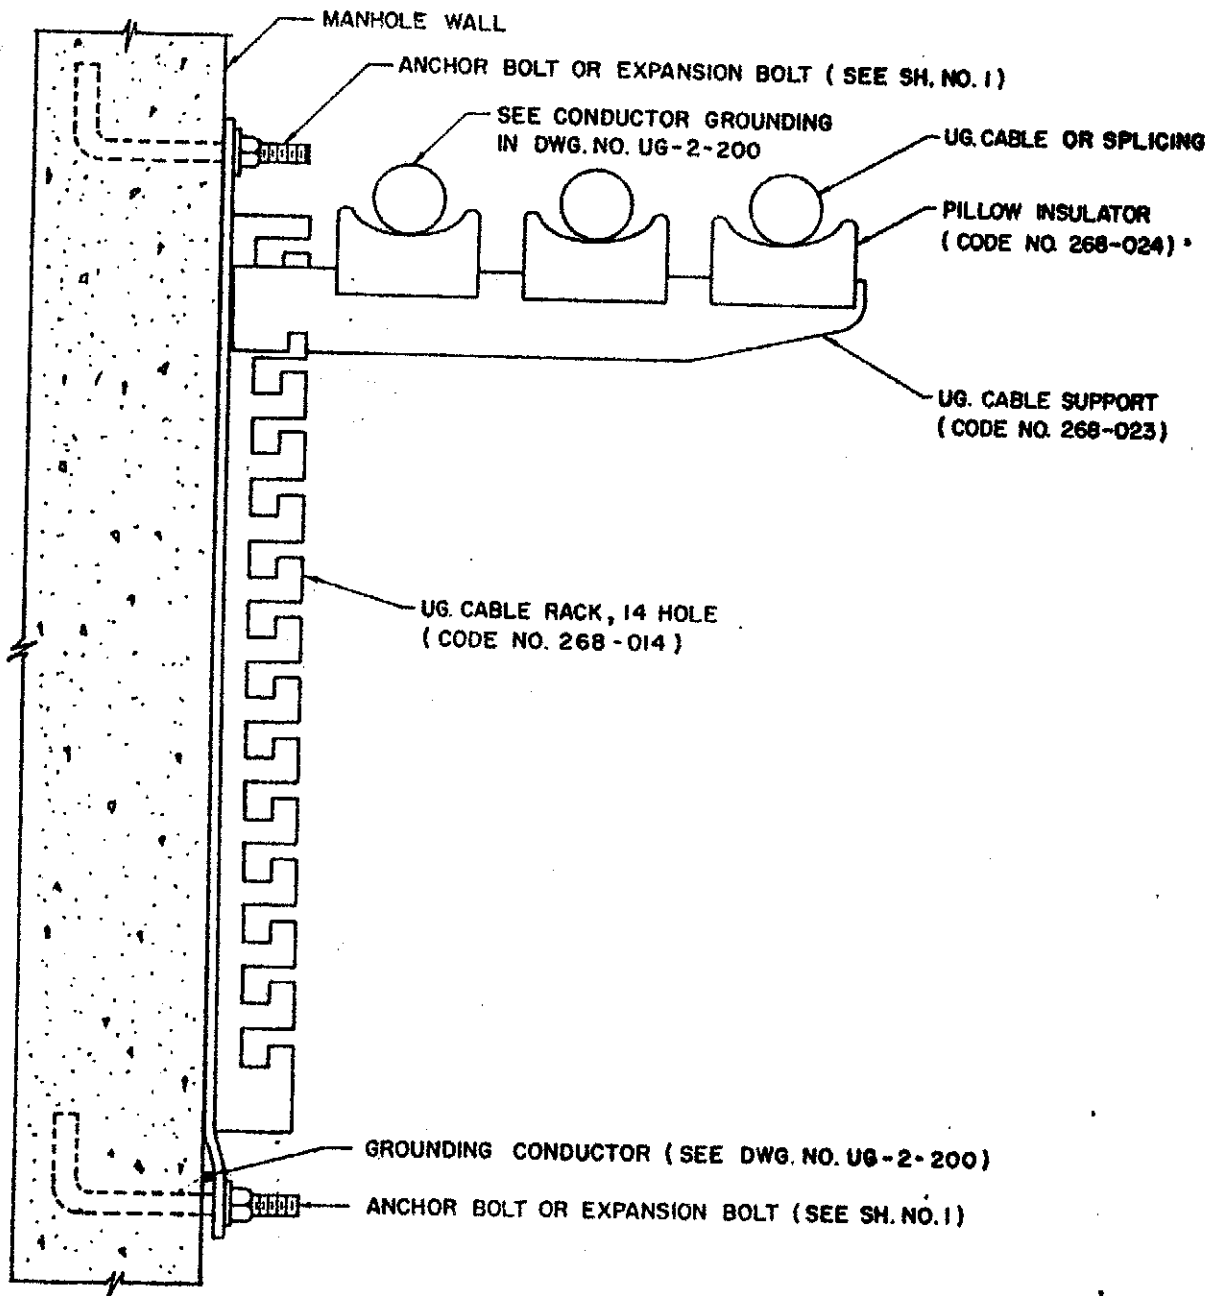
EXPANSION BOLT INSTALLATION (TYPICAL)
